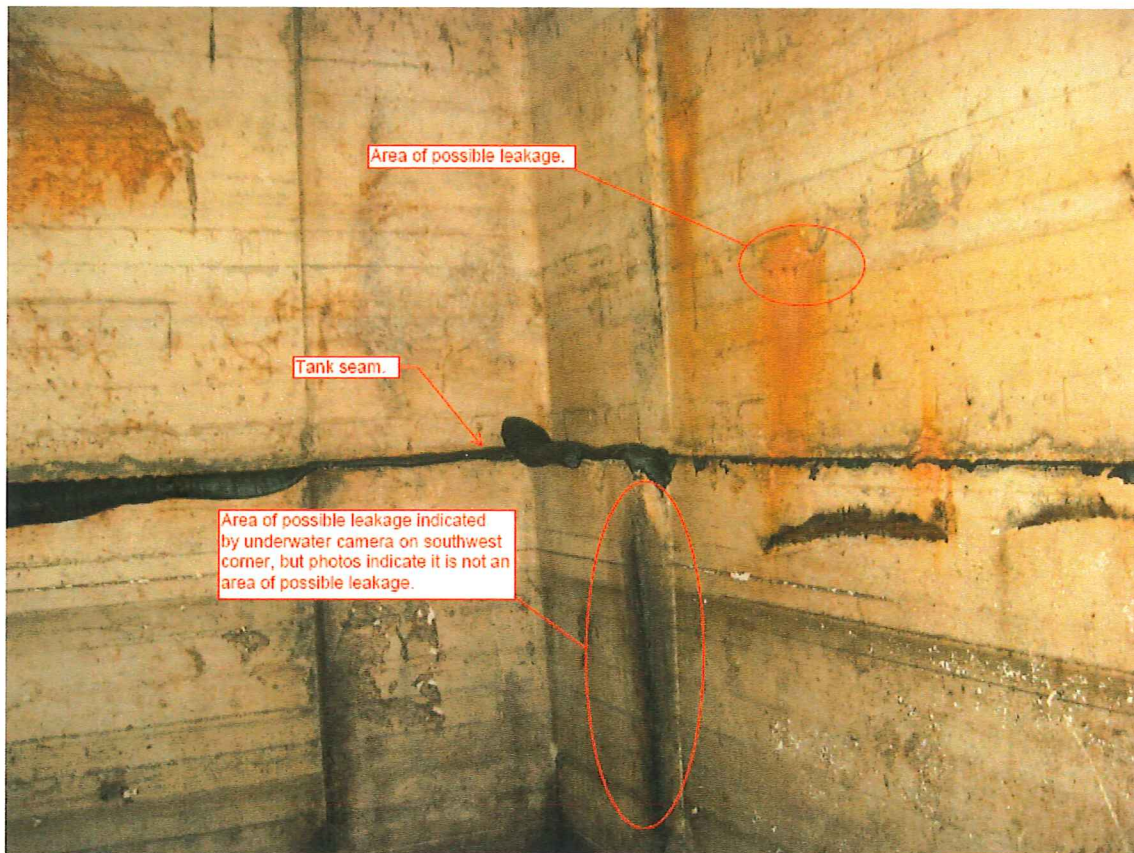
Areas of Rust on Southwest Corner of Inspection Building Holding Tank
